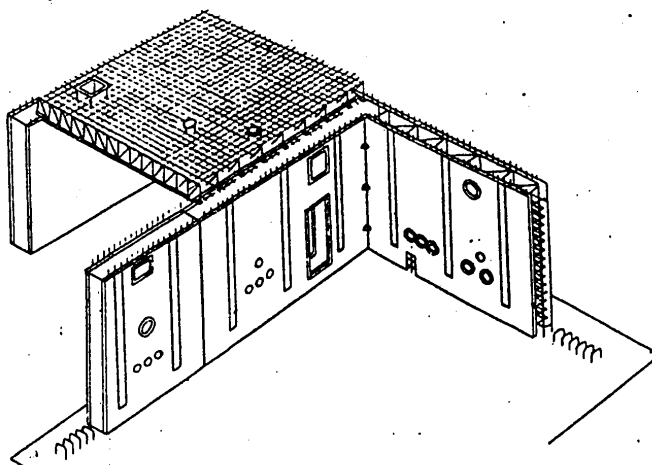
Fragment of the wall and ceiling made of reinforced concrete cells.
